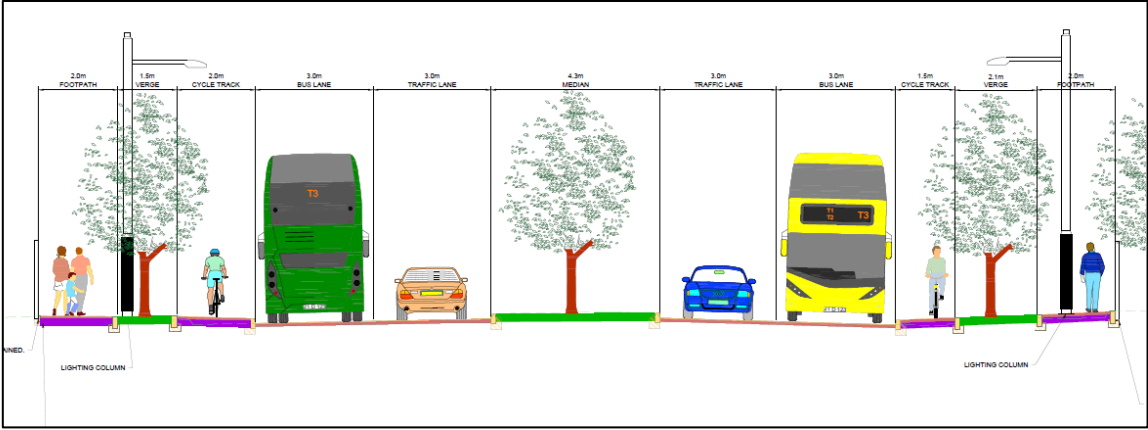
Cross Section P-P from General Arrangement Sheet 28
